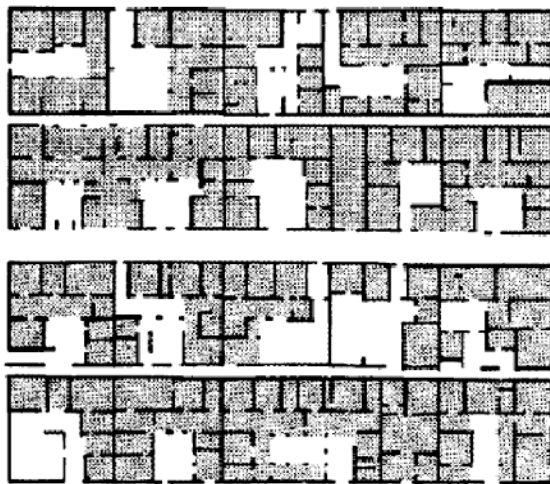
Plan redrawn from excavations at Olynthus: The Hellenic House
